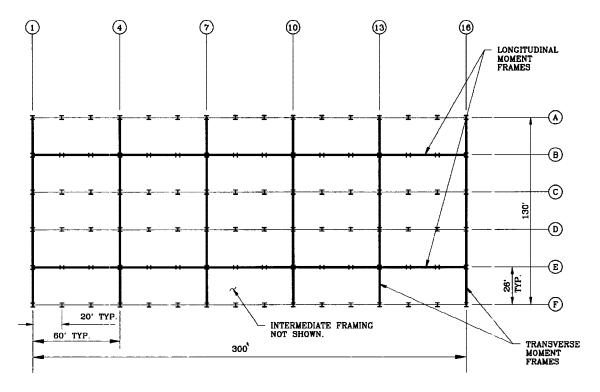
TYPICAL FLOOR PLAN OF STRONG BEAM BUILDING
